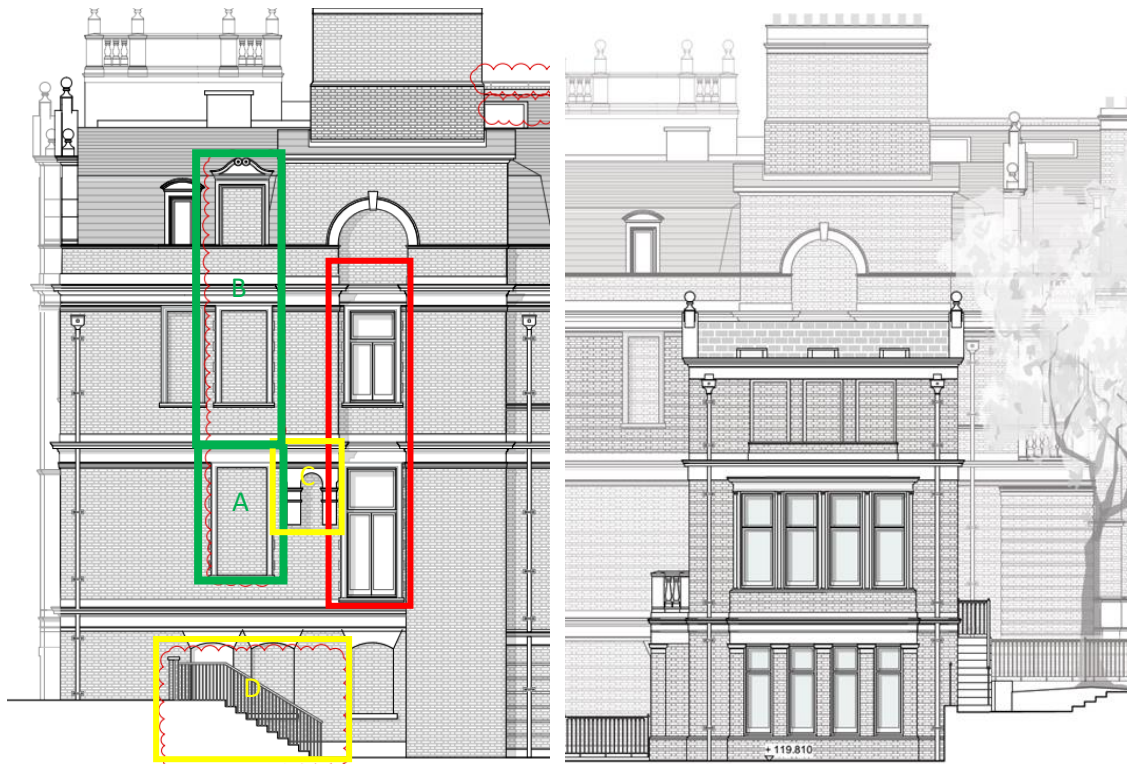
A elevation drawing showing the alterations to the Edwardian block (left) and a drawing showing the proposed elevation (right). As part of the s.73 granted application, three windows on this elevation have received permission to be blocked (highlighted in green). The other elements that have been consented to be removed and altered are highlighted in yellow. The windows proposed to be blocked is highlighted in red.
